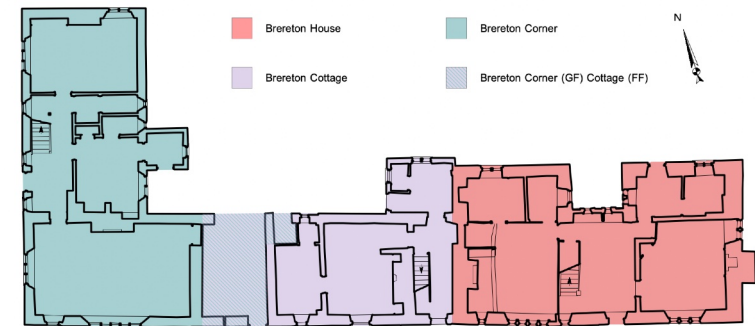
Ground floor block plan, showing modern division of site in Brereton House, Brereton Cottage, and Brereton Corner.
